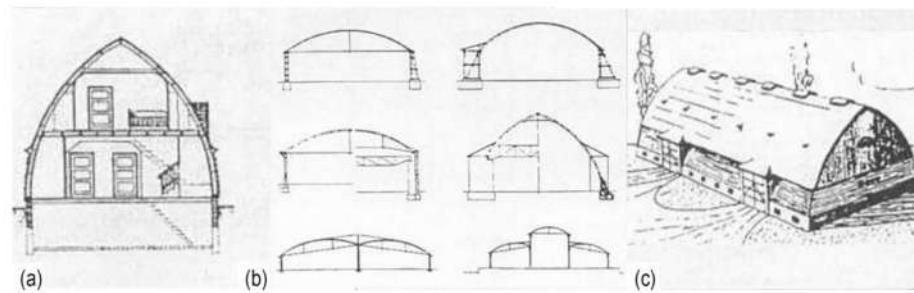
Lamella roofs for (a) housing, (b) halls and (c) barns [5].
